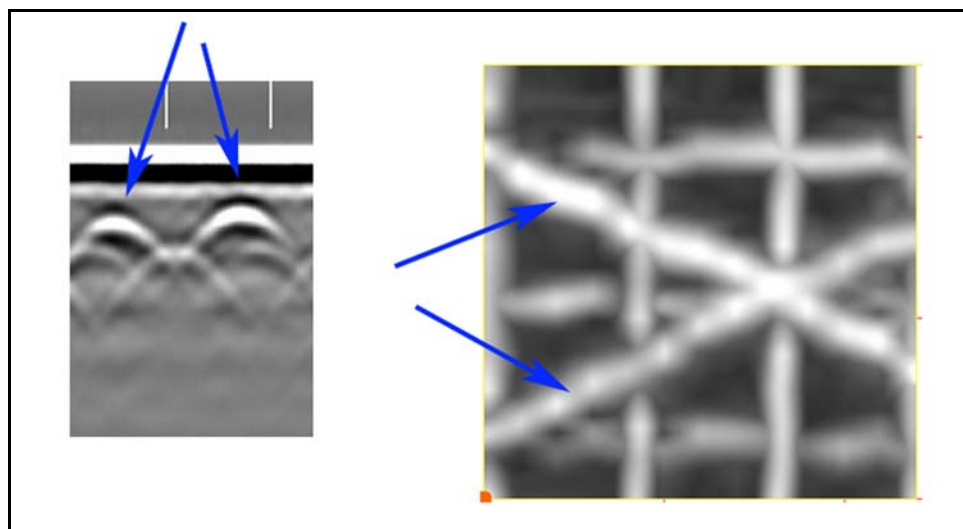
Two cables located above the rebar mat – vertical profile and plan view.
